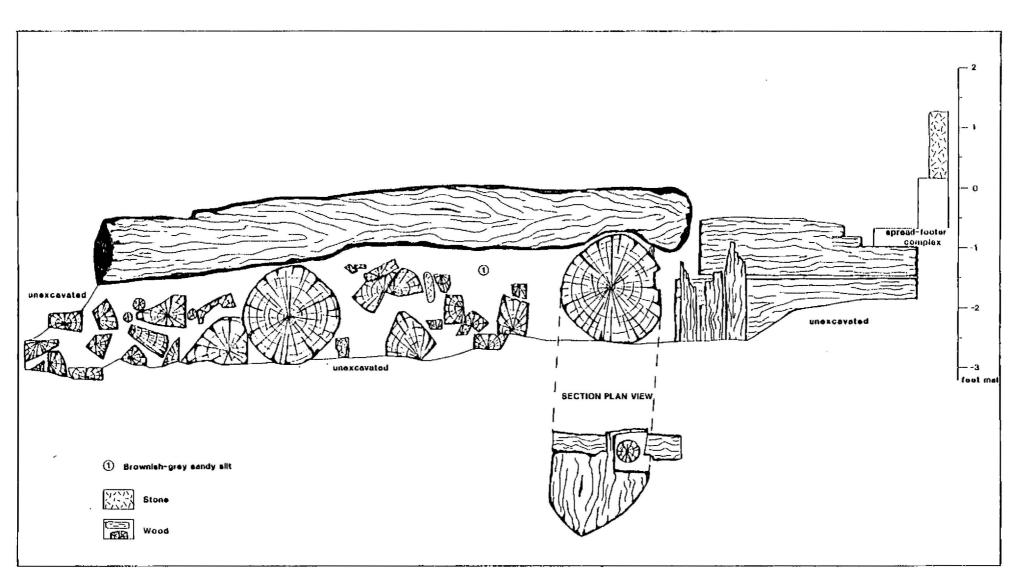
Profile, east wall of Backhoe Trench AO in Lot 26, showing west face of "Cobb" wharf and plank bulkhead, with section plan view of joint between logs at northern end of wharf.
